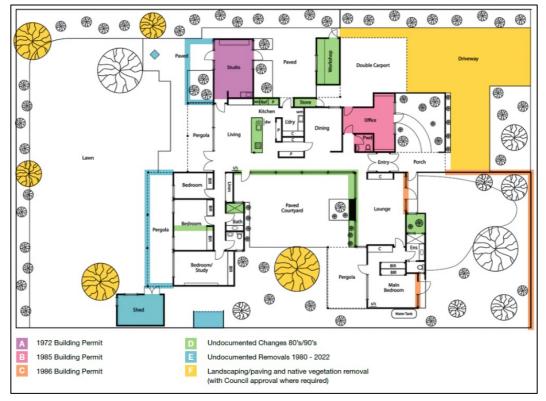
Site plans highlighting elements of the property impacted (plan provided by the owners).
